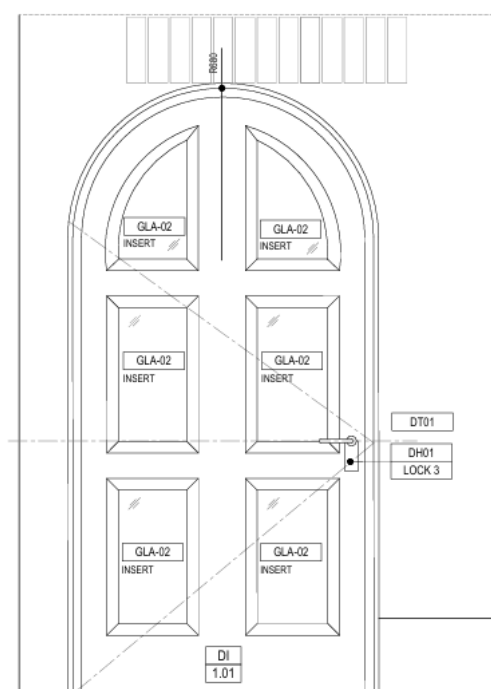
Elevation of proposed new door (Studio C+E drawing AD 1.03)
